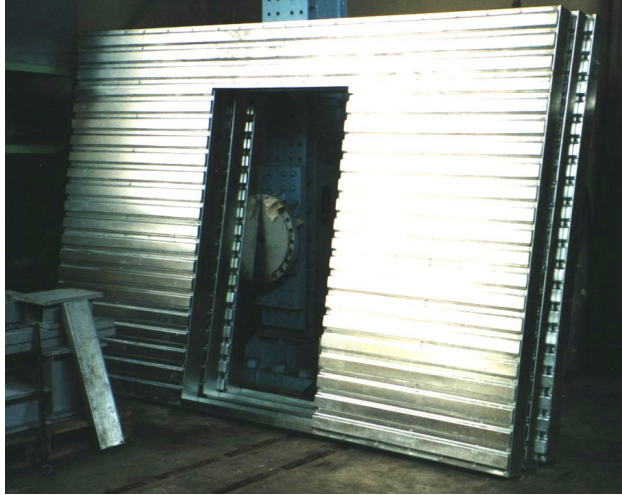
Wall stud panels made of cold-formed steel sections
